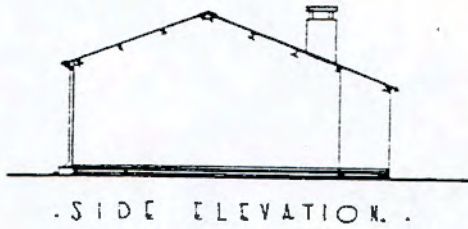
Type plan built in Atteridgeville, Pretoria.
